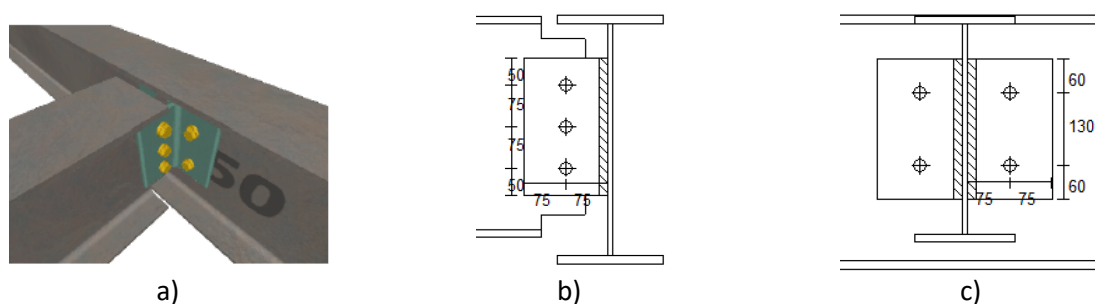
Configuration of pinned joint – frames B/1-7, C/1-7 – CS/S: a) 3D view of the joint, b) side view of the joint, c) front view of the joint
